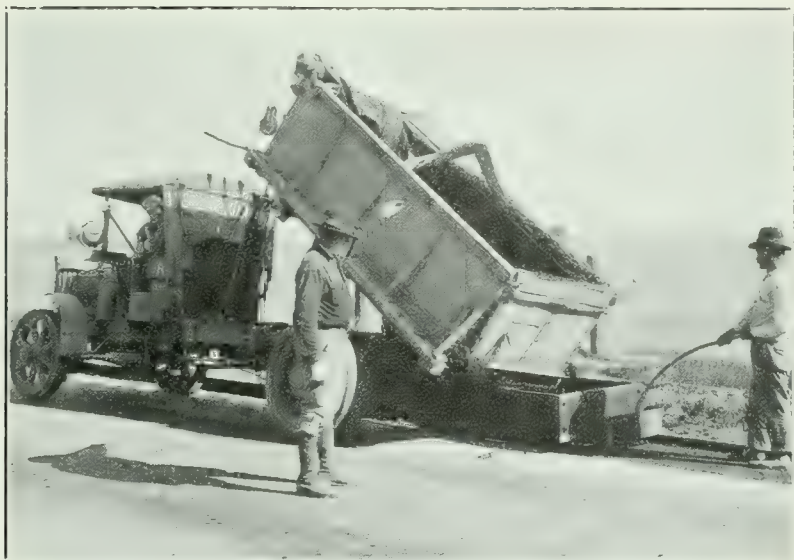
Plate XL. Widening pavement on State Highway in Solano County. Rig for spreading asphaltic concrete shoulders.
